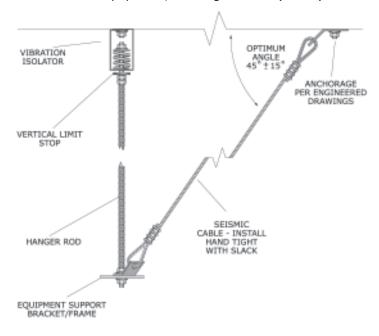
Attachment of cable/rod assembly to the equipment. $\label{eq:cable_rod}$
